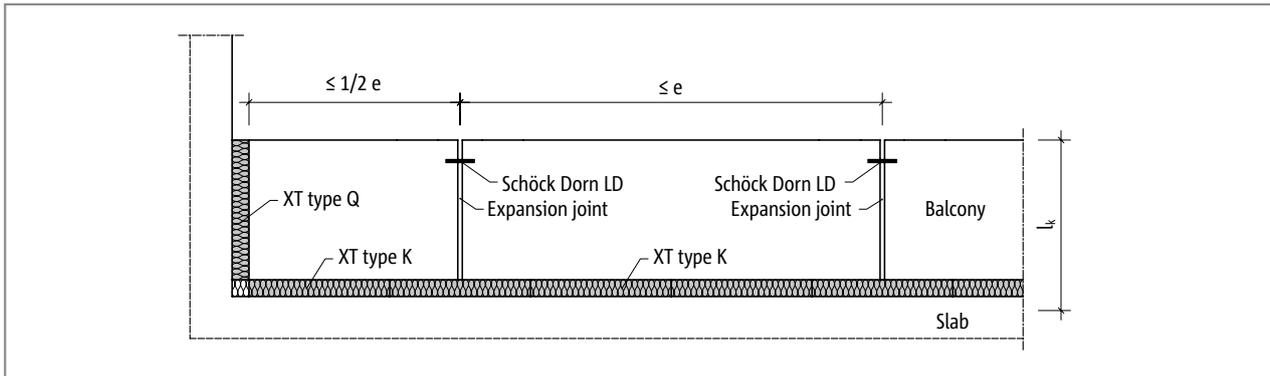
Schöck Isokorb® XT type K: Expansion joint arrangement
